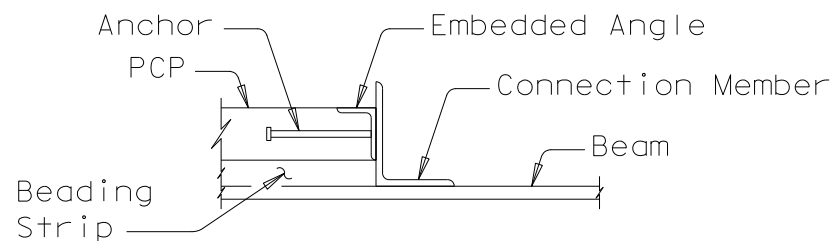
Partial Elevation of Embedded Angle Connection PCP Specimen
